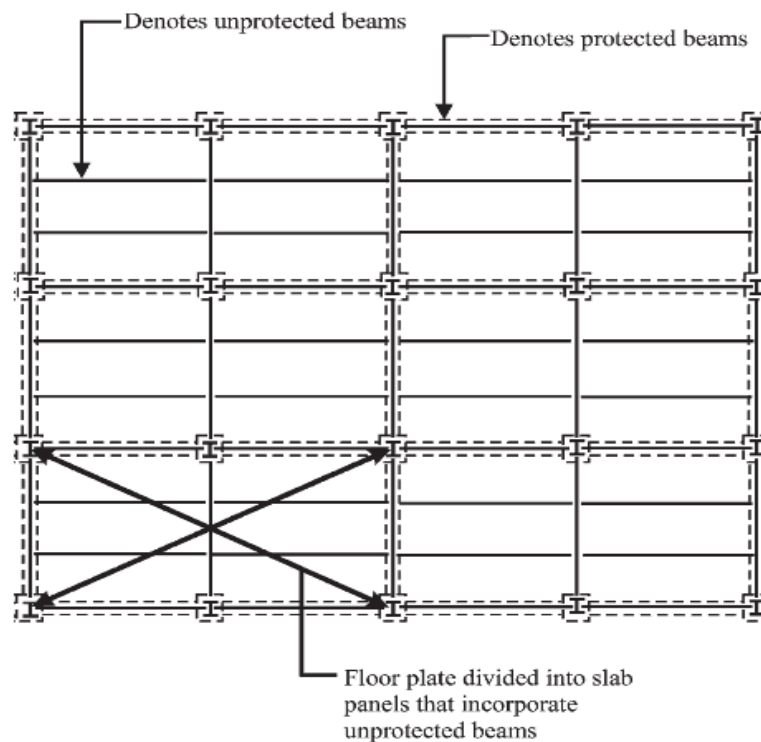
Division of floor into slab panels with unprotected beams (Bailey, 2003)
